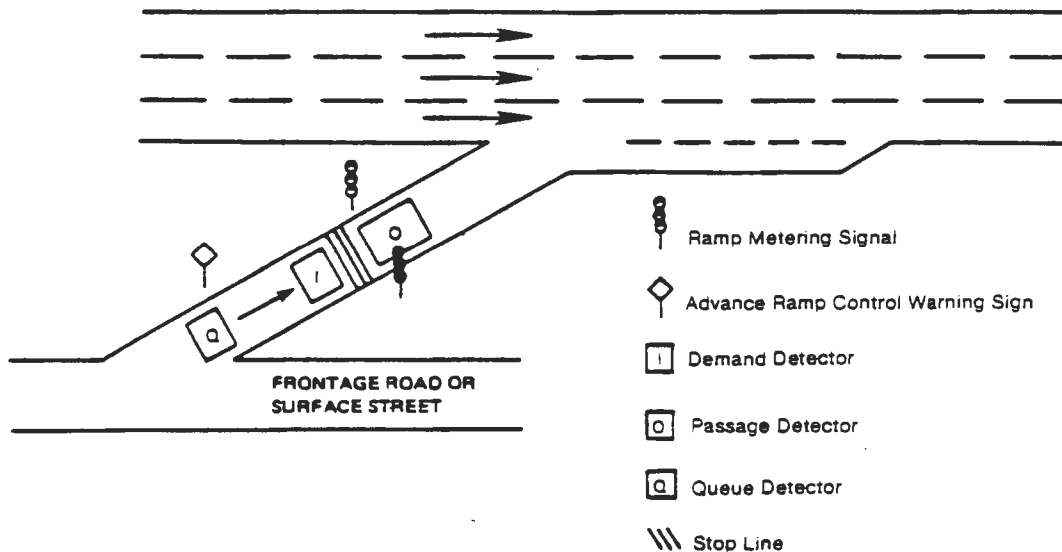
Layout of Pretimed Entrance Ramp Metering System
